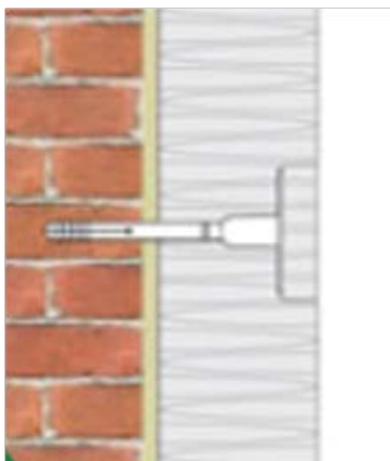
Scheme of ventilated facade composition on a brick wall with wooden bearing structure
